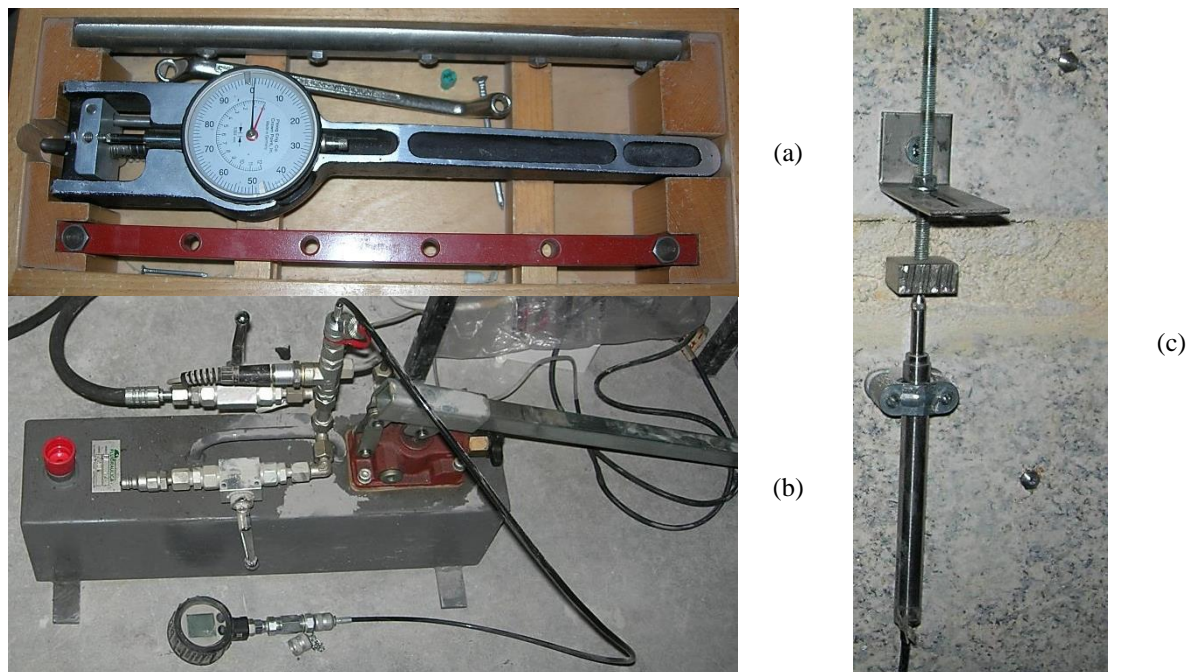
Equipment used in flat-jack testing: (a) demountable mechanical strain gage (DEMEC); (b) hydraulic pump; and (c) linear variable displacement transducers (LVDTs) and gage points
